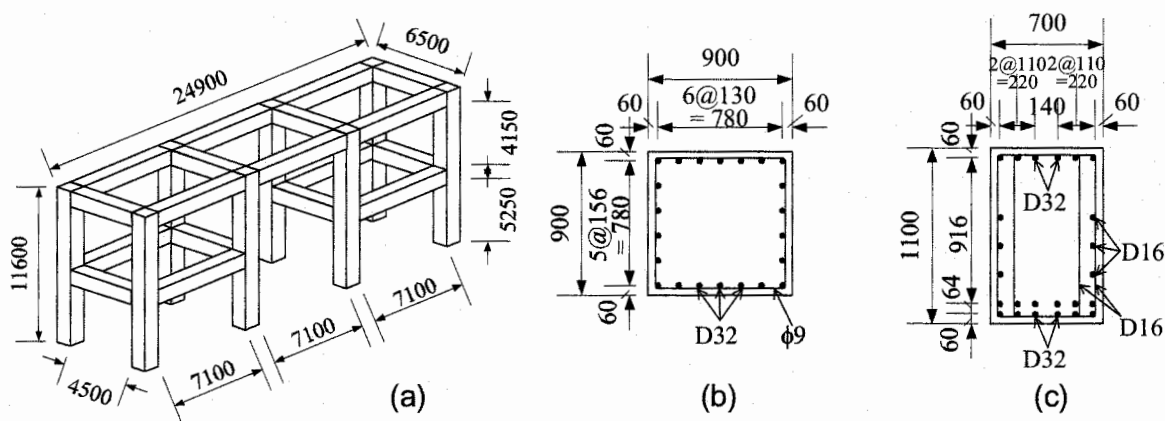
Shimokema R5 Viaduct: (a) 3D view, (b) Cross Section of the Column and (c) Cross Section of the Beam
